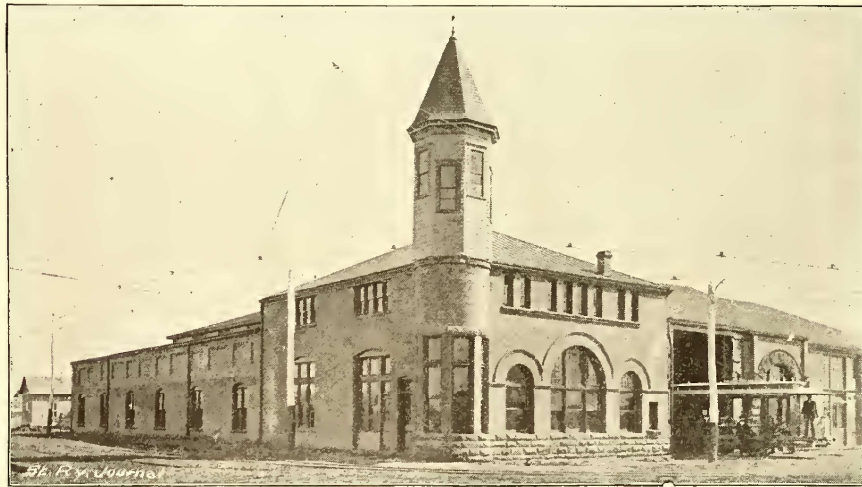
CAR HOUSE—QUEEN CITY RAILWAY, DALLAS.
